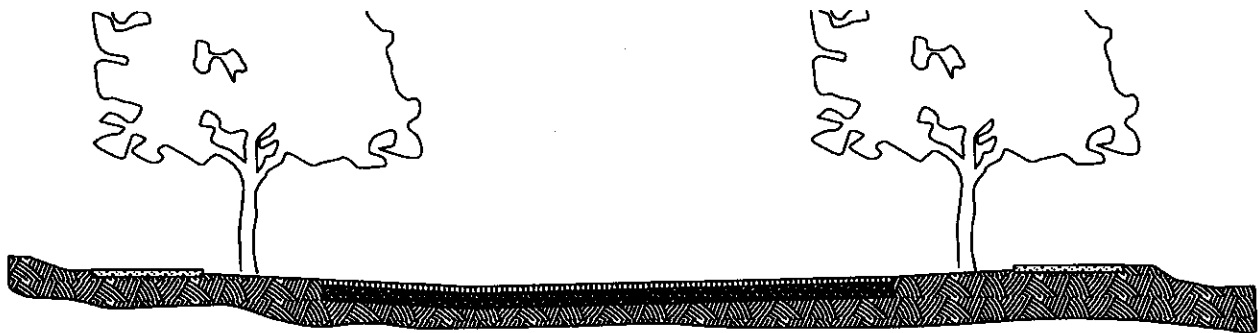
Street Design Option C - Valley Section with Main Line Storm Sewer
